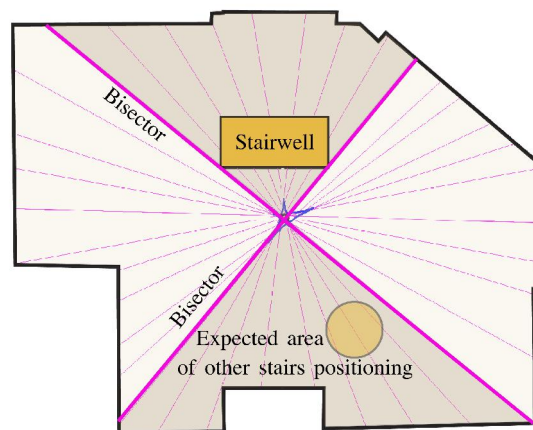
The position of the stairs within the building floor plan: bisector-related balance
